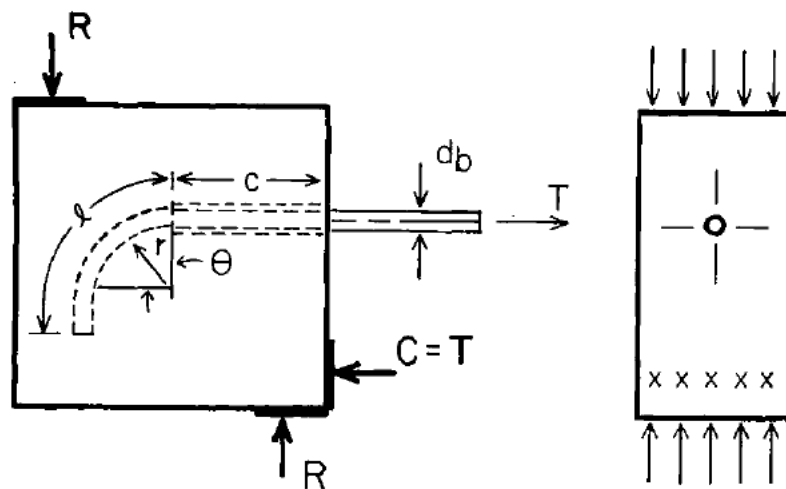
Test specimen (Minor and Jirsa 1975)
